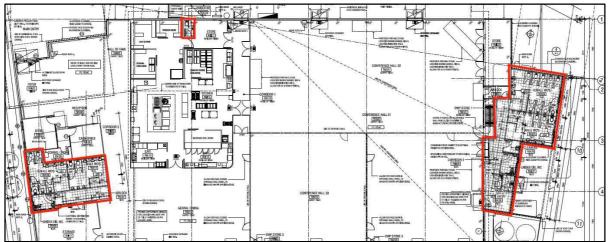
Extract of Floor Plan with Wet Areas identified (Source: Icono)
